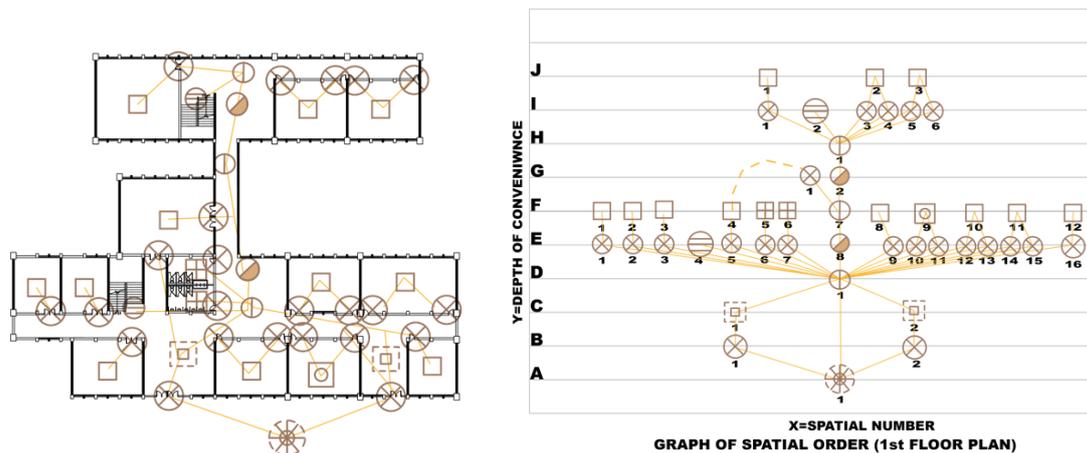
1st floor plan of Iikane Elementary School (Left) and Spatial hierarchy (Right)
